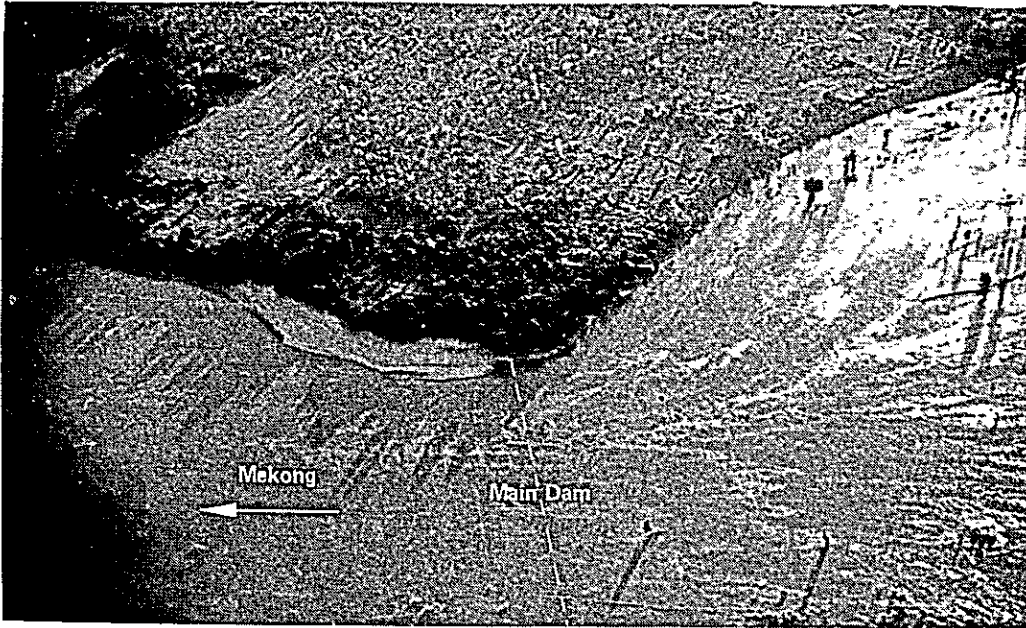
Right Bank of Sambor Dam Site (December 1964)
